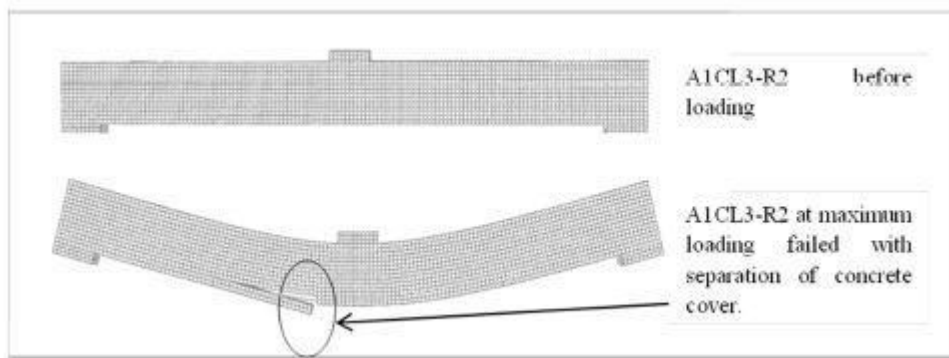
Concrete cover separation-Mode of failure Ref(6)
